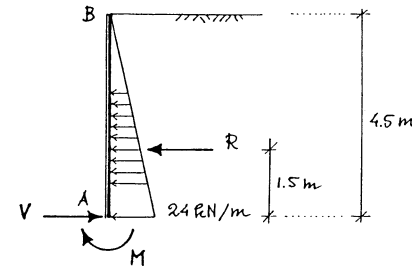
The horizontal load on a vertical strip of sheet piling that is 1-metre wide modelled as a line element for when the soil behind the sheet piling is entirely dry. Shear force V and the bending moment M in cross-section A are also shown.
